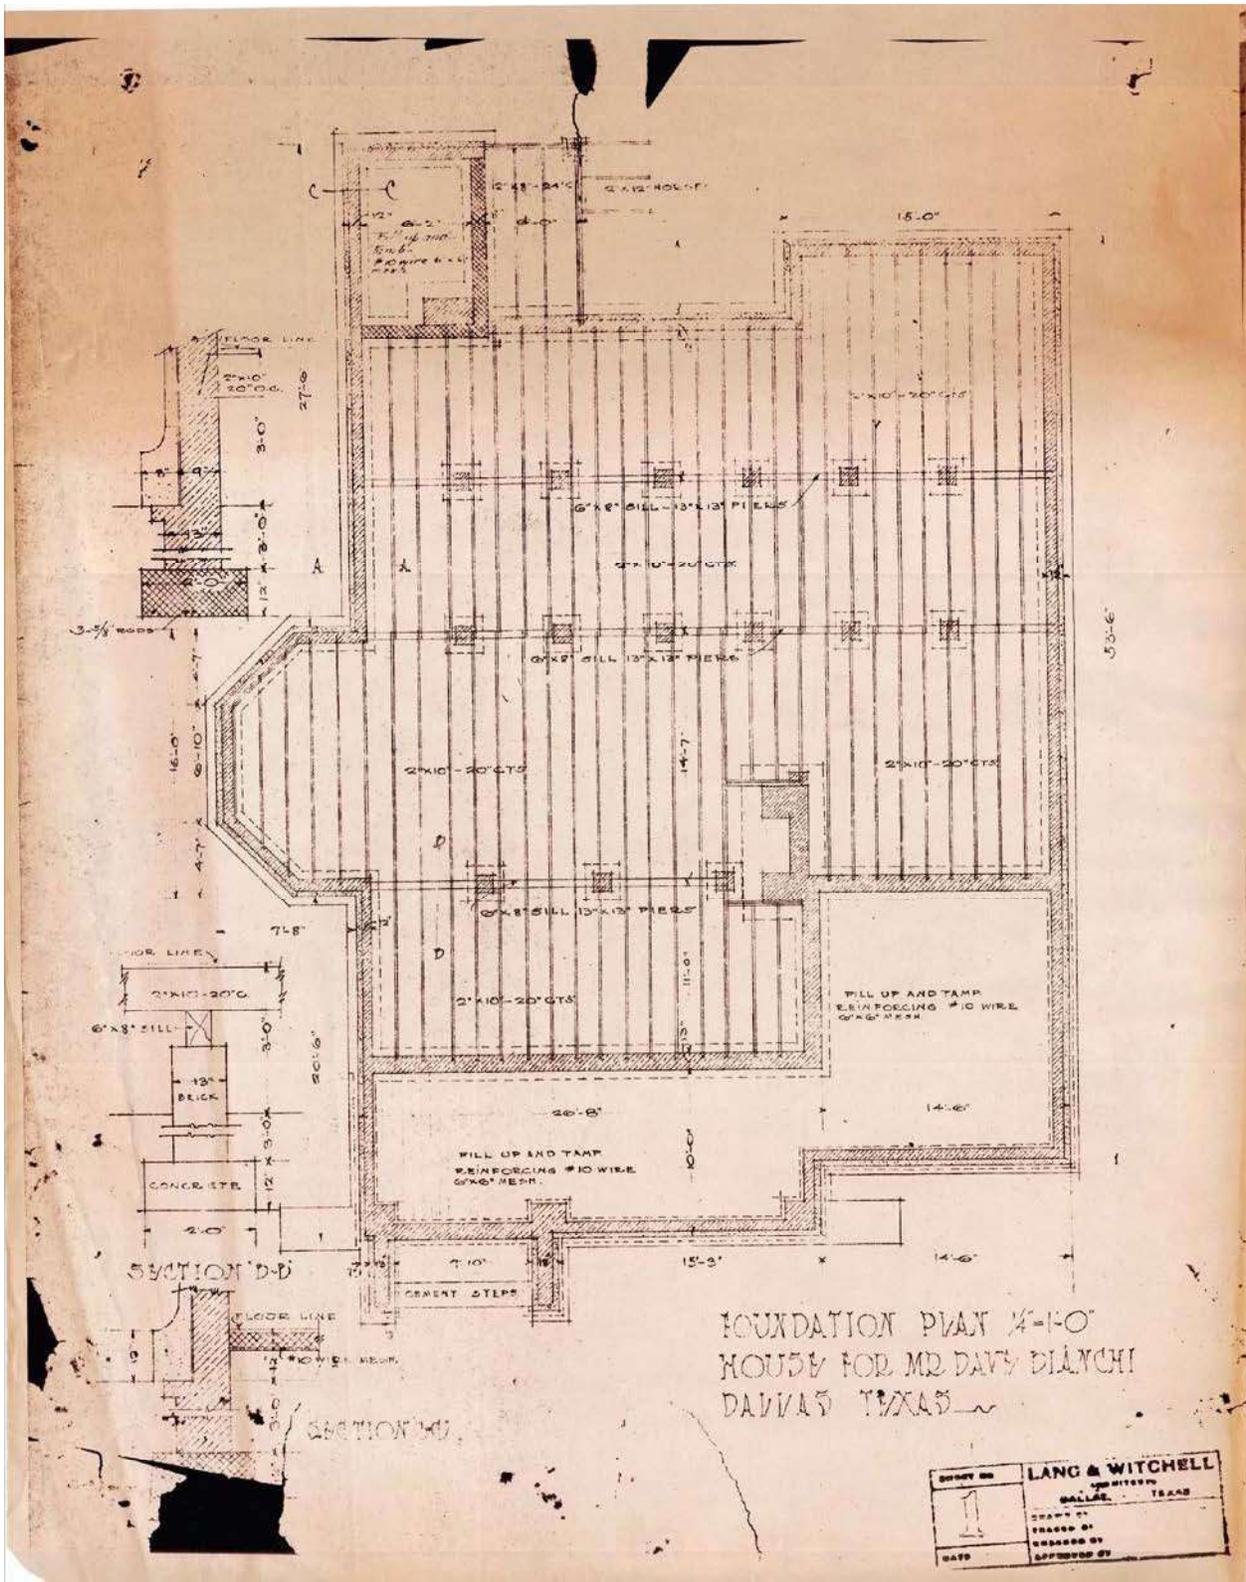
Original Lang and Witchell Foundation Plan—Sheet 1
